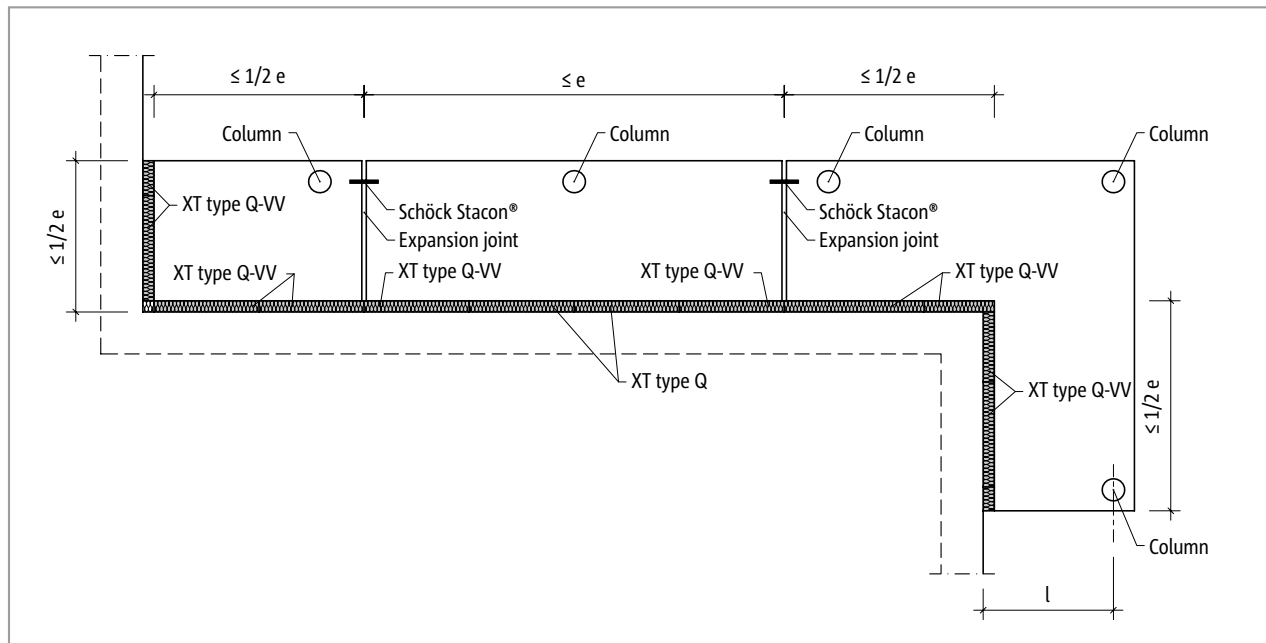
Schöck Isokorb® XT type Q, Q-VV: Expansion joint arrangement
